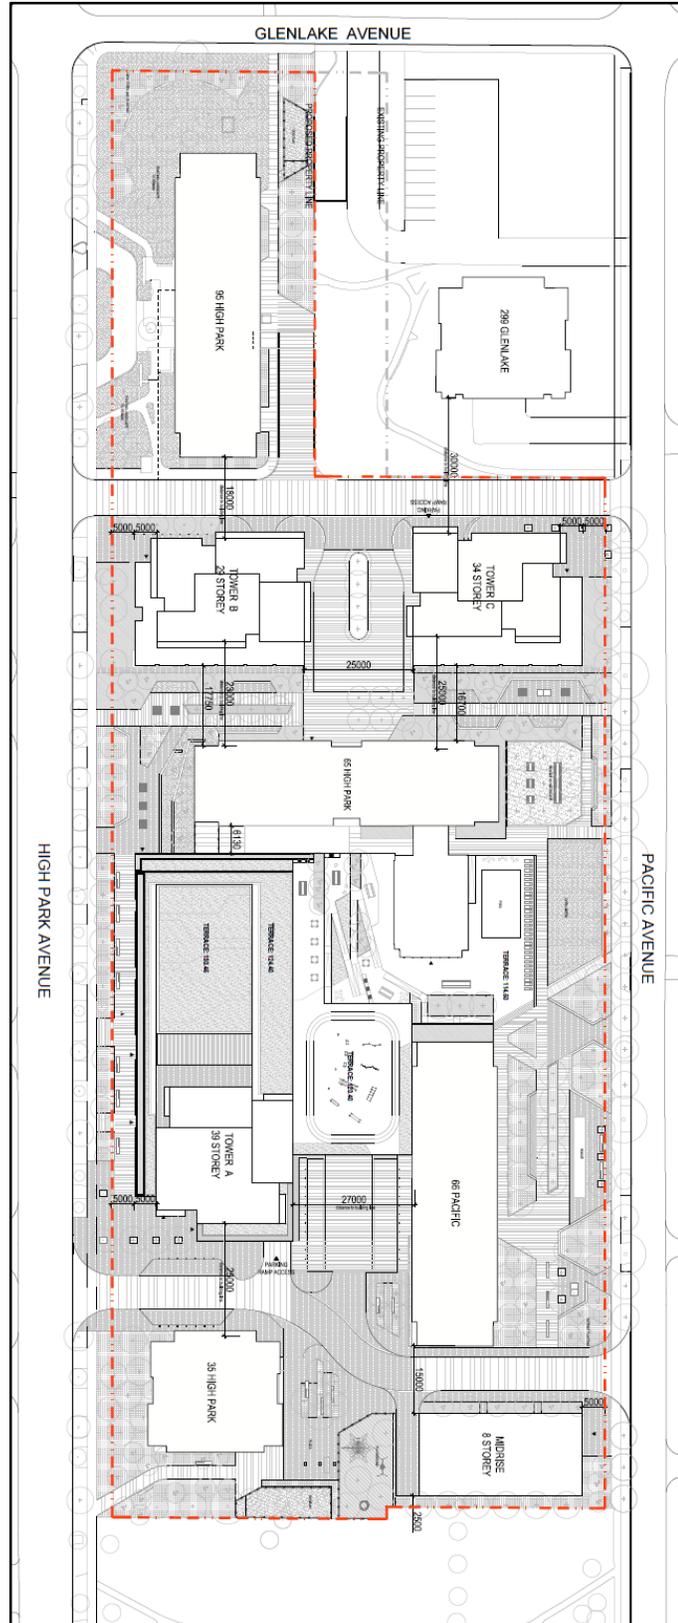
Proposed Site Plan for 35 High Park Avenue site (Zeidler Partnership Architects, 2016).
